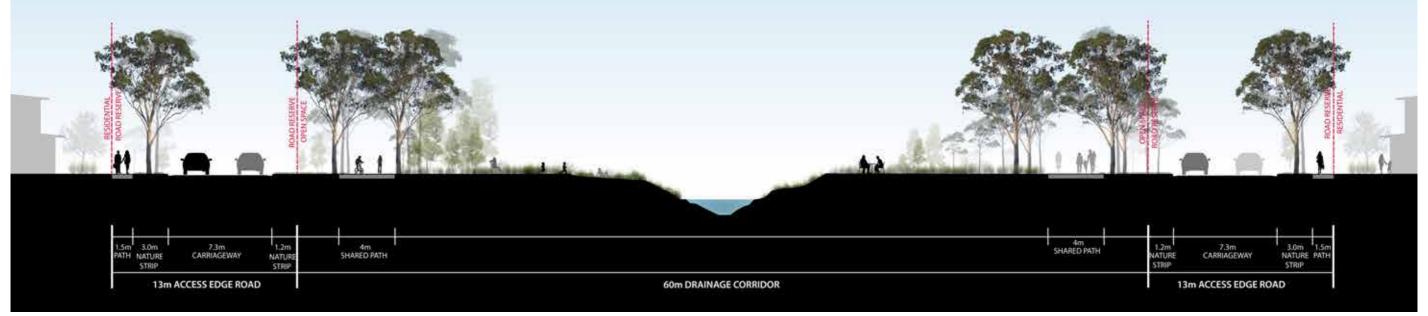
Typical Drainage Reserve Cross Section / Interface Treatment
